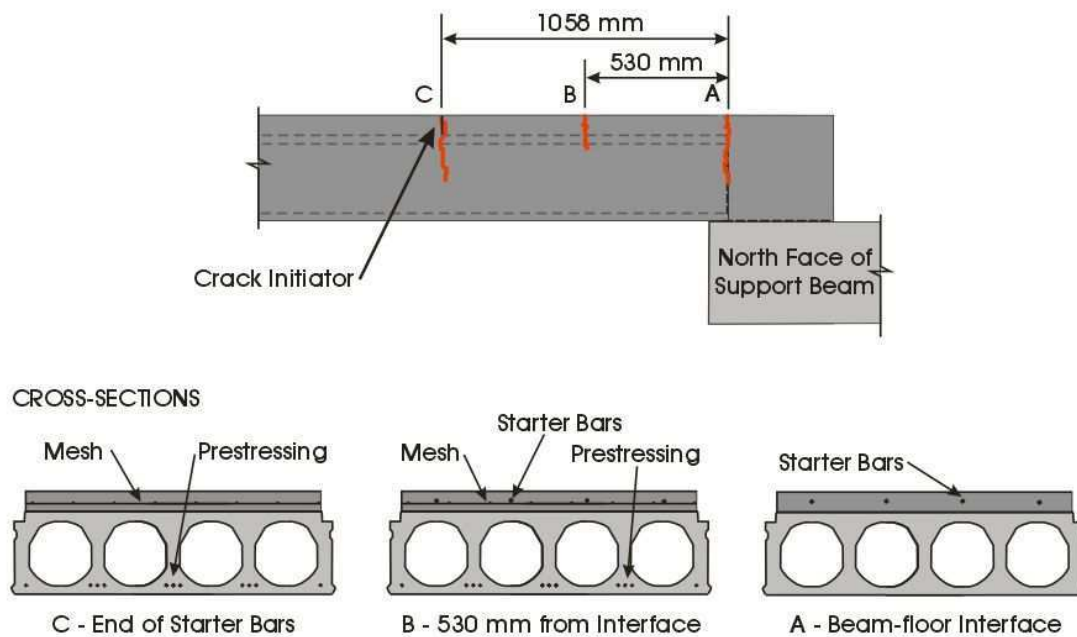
Locations cracks formed during Stage One of test HCW1 and cross-sections of the specimen at these locations
